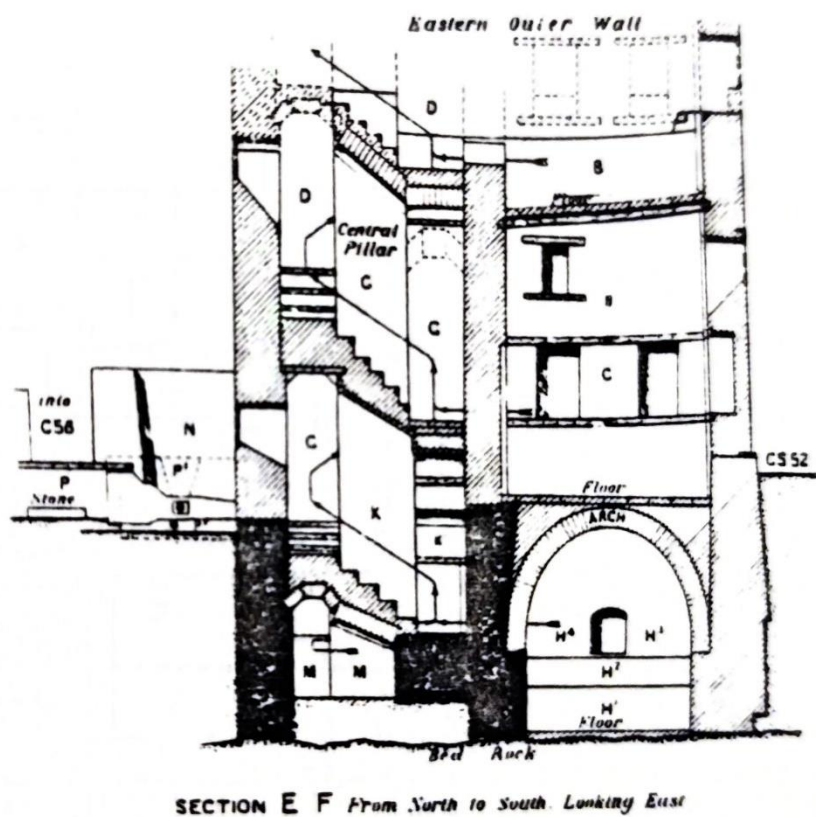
Elevation of Karanis House C62. The floor on the second floor is tilted (Husselman 1979, plan 41).
